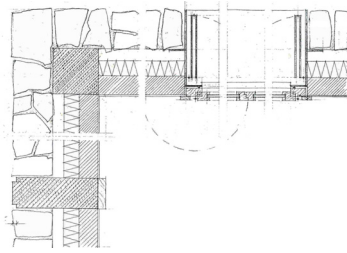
Casa de Piedra at Tavole by Herzog & de Meuron; Fig. 7.121 Detail of wall construction - concrete structure with dry stone wall infill
